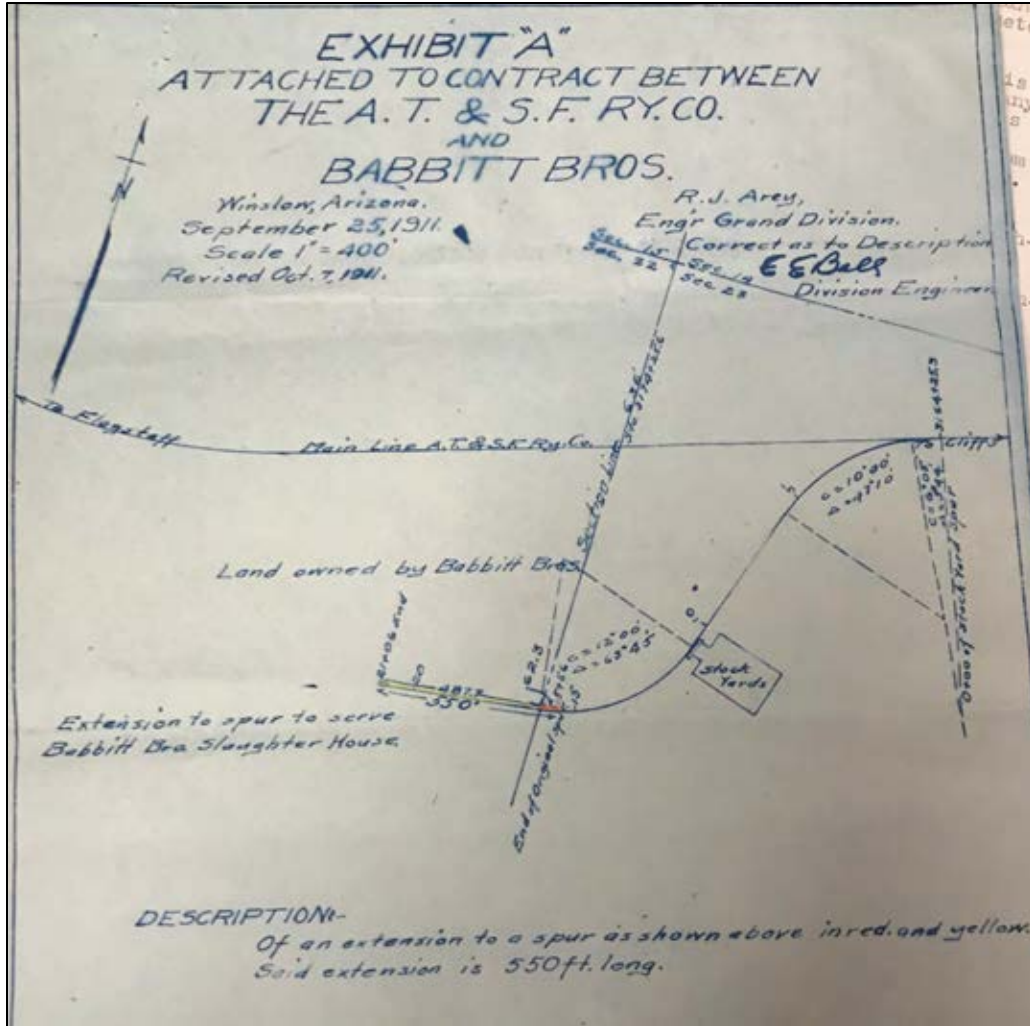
1911 engineering drawing of proposed 550-foot railroad spur extension.
